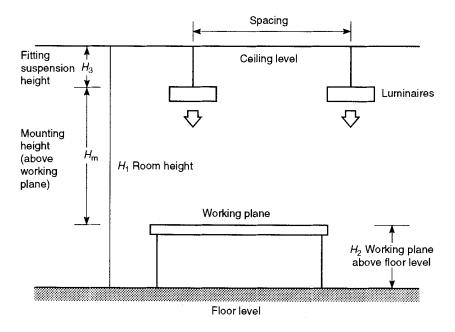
Relationship between floor level, working plane, fitting mounting height and spacing between each fitting
